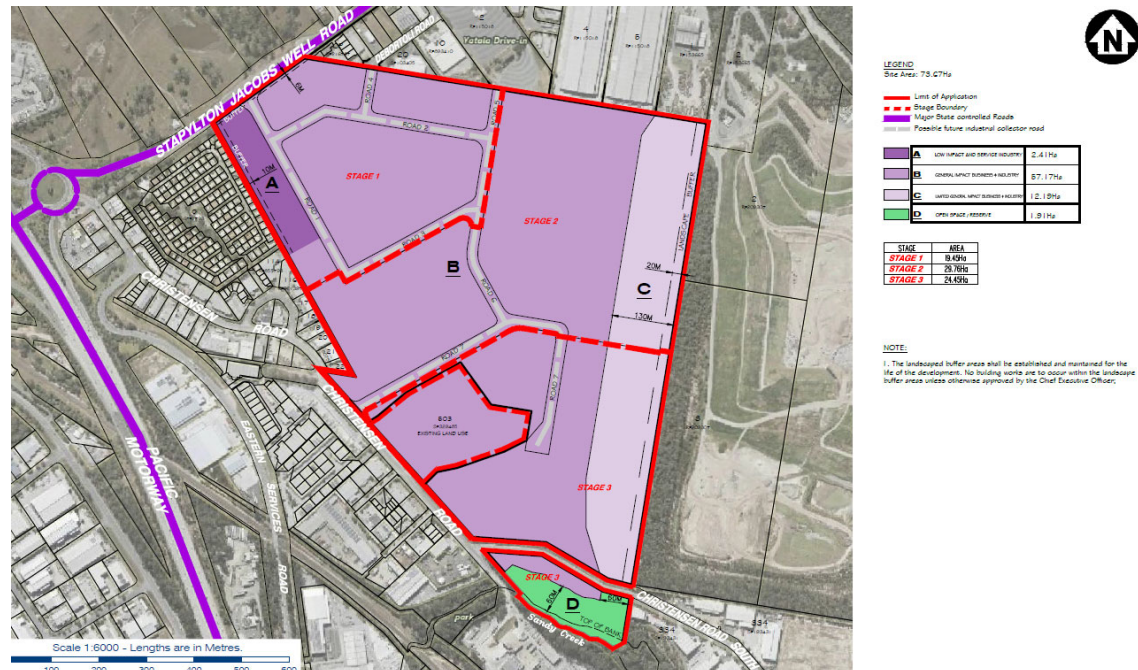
Proposed Staging Plan (Source: Gassman Development Perspective)
